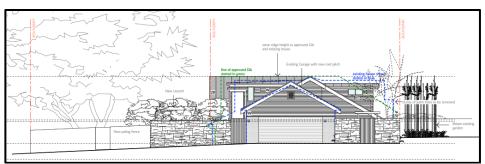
Southern Elevation (s4.55 plan set, dated March 2021)
